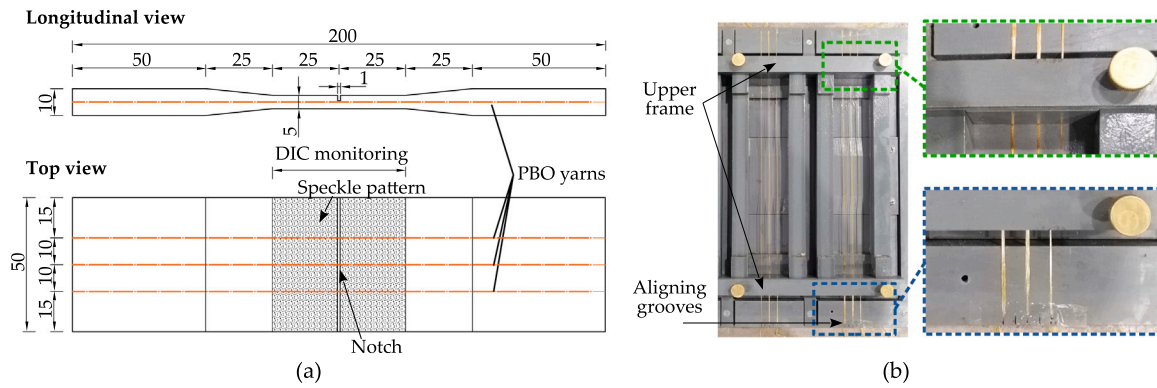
(a) Double-sided pull-out specimen geometry (dimensions in [mm]), and (b) on-purpose modular plastic mould for manufacturing. Details on yarn alignment and fixation are also shown.
